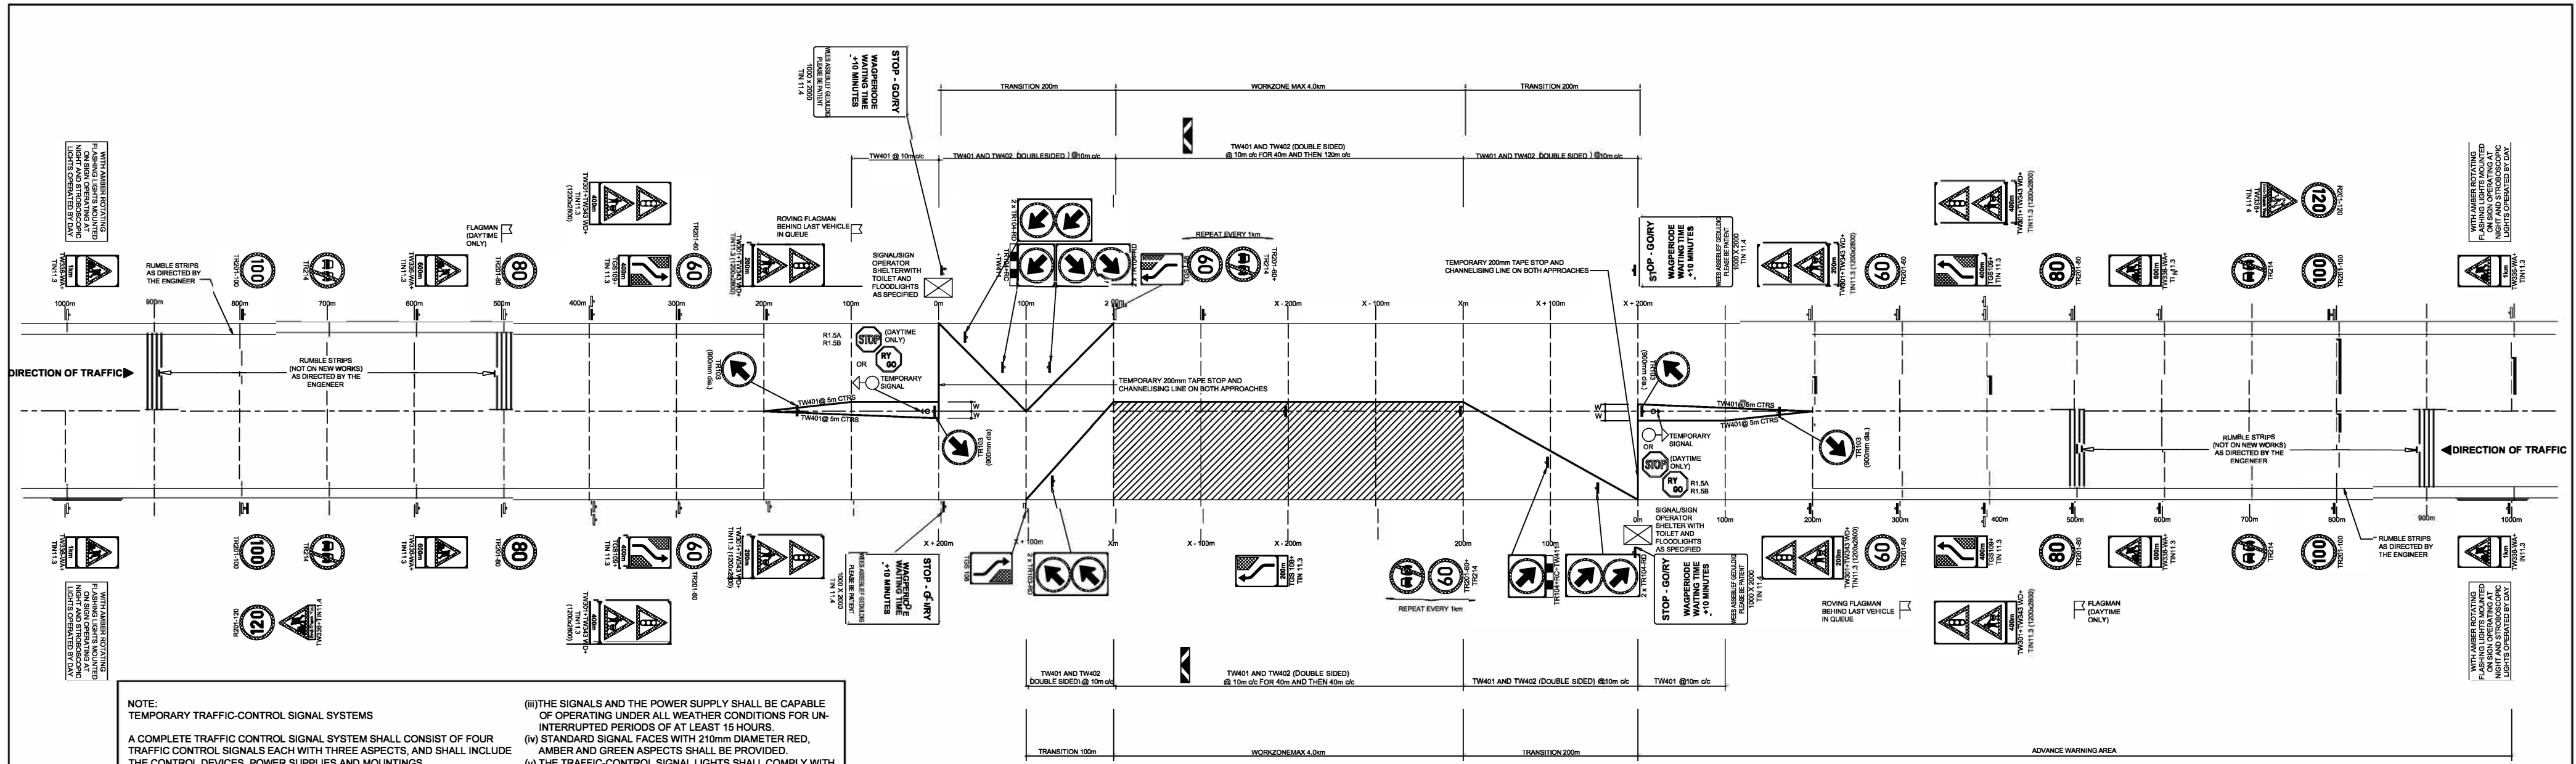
TEMPORARY SINGLE LANE TRAFFIC SIGN LAYOUT (WORK ZONE RIGHT)
